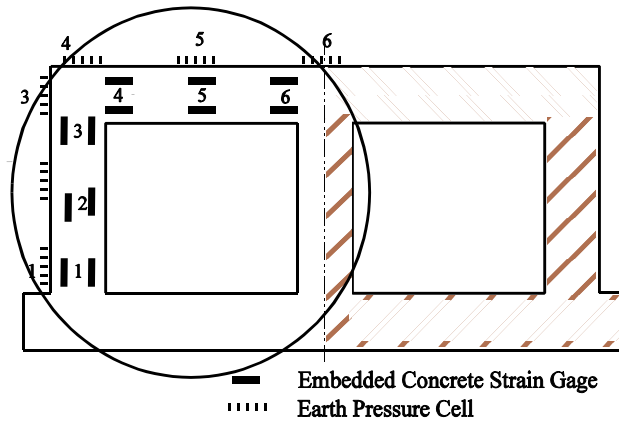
Sullivan Co. Culvert Instrumentation Plan
